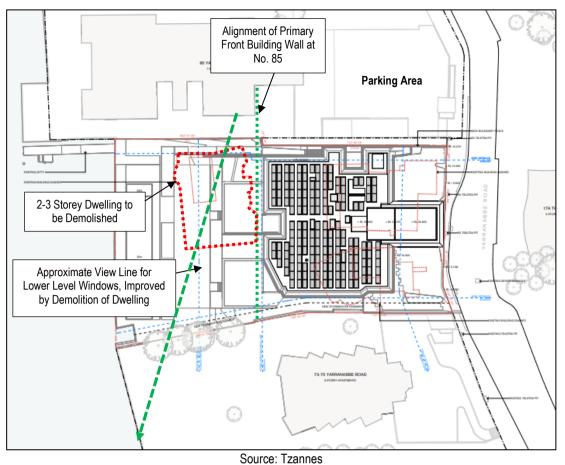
Site Plan Demonstrating Neighbouring Viewlines
